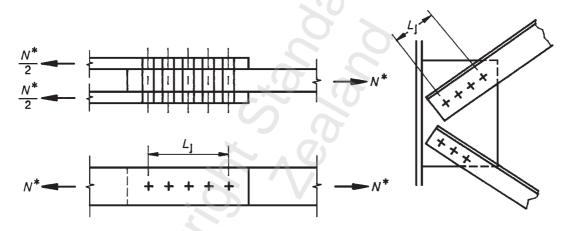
(1) – Lap joint and gusset connection
